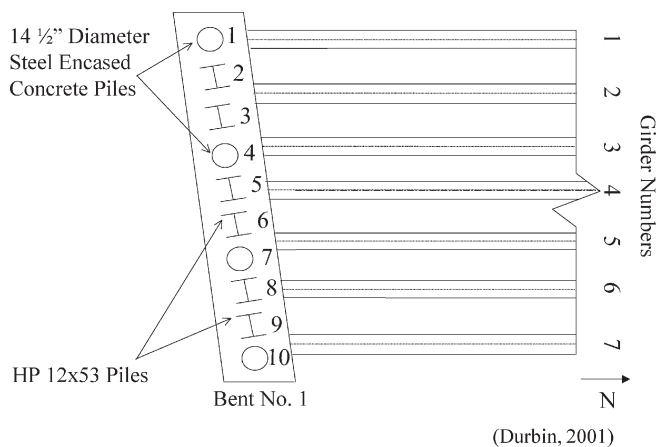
Plan View of Location of Piles for I-65 over SR-25
